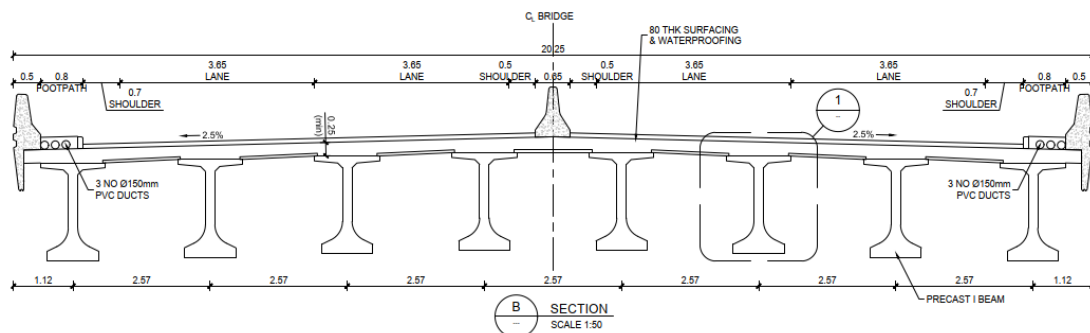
Typical cross section (Precast I-beams) for Barishal-Bhola access spans and connection spans.
